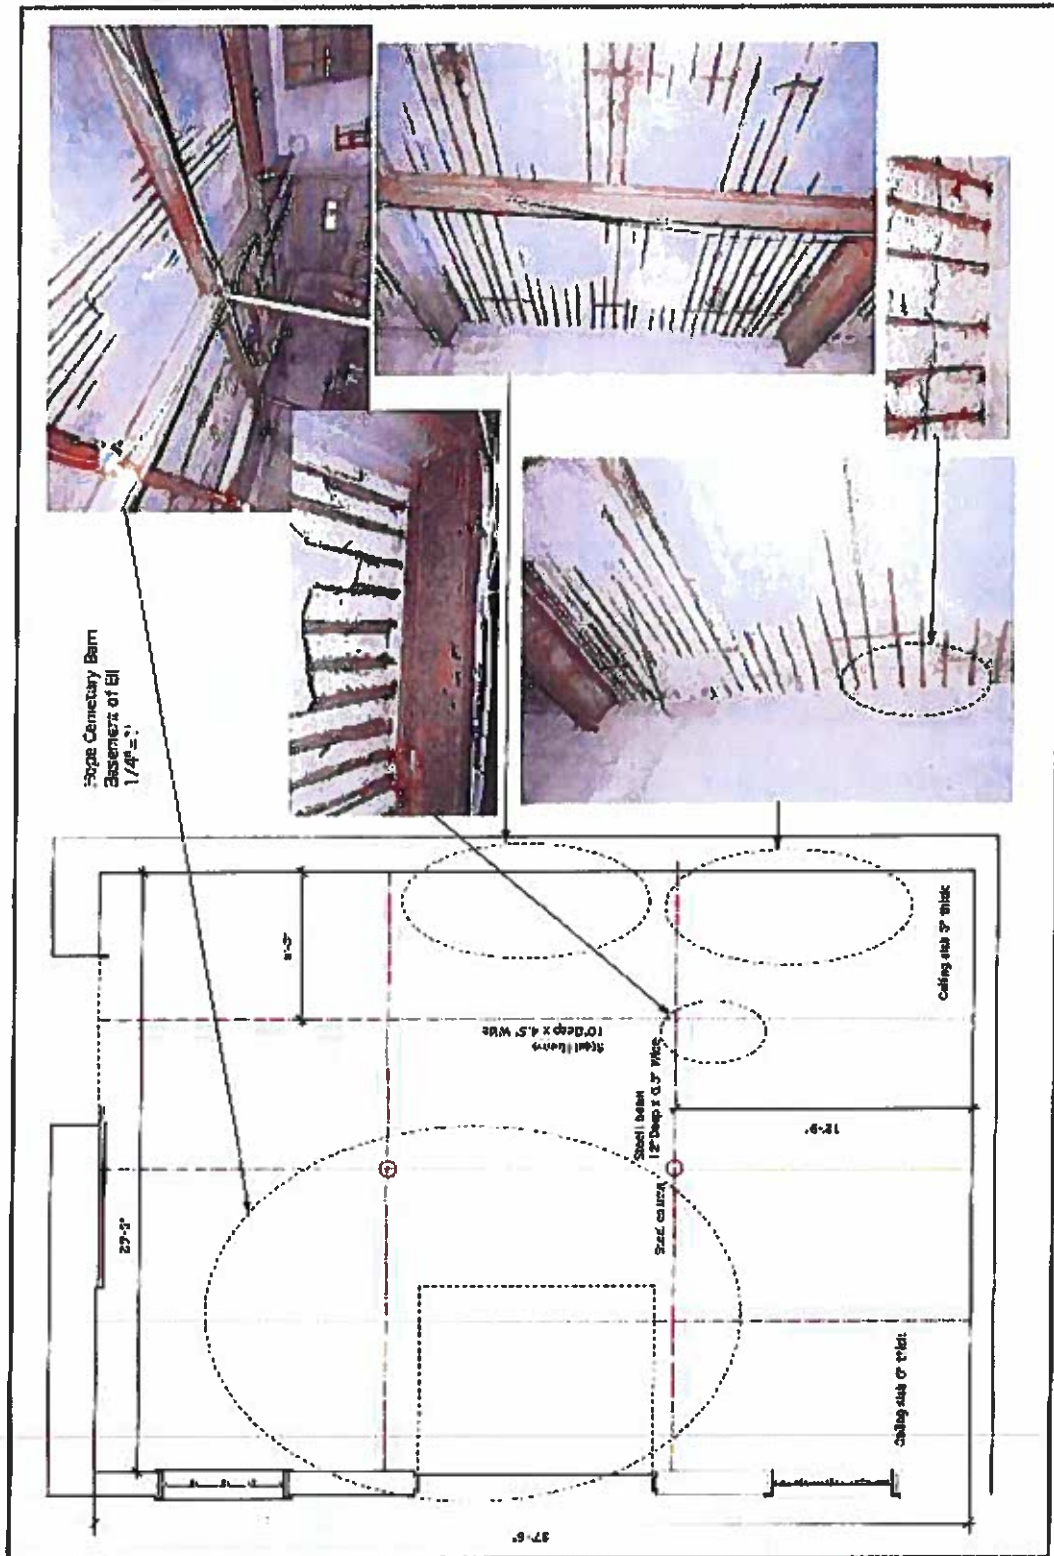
Photographs of ell barn basement ceiling showing spalling and severely rusting rebars. This is a significant current structural issue that needs to be evaluated by a structural engineer as a high priority.
